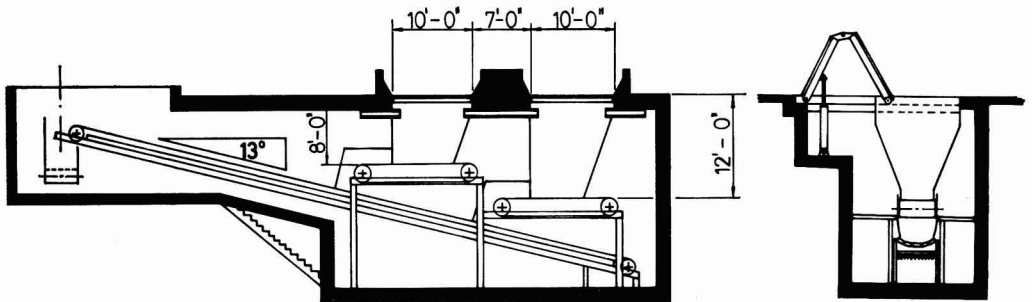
Section through unloading hoppers and (right) jack knife door open to receive load
